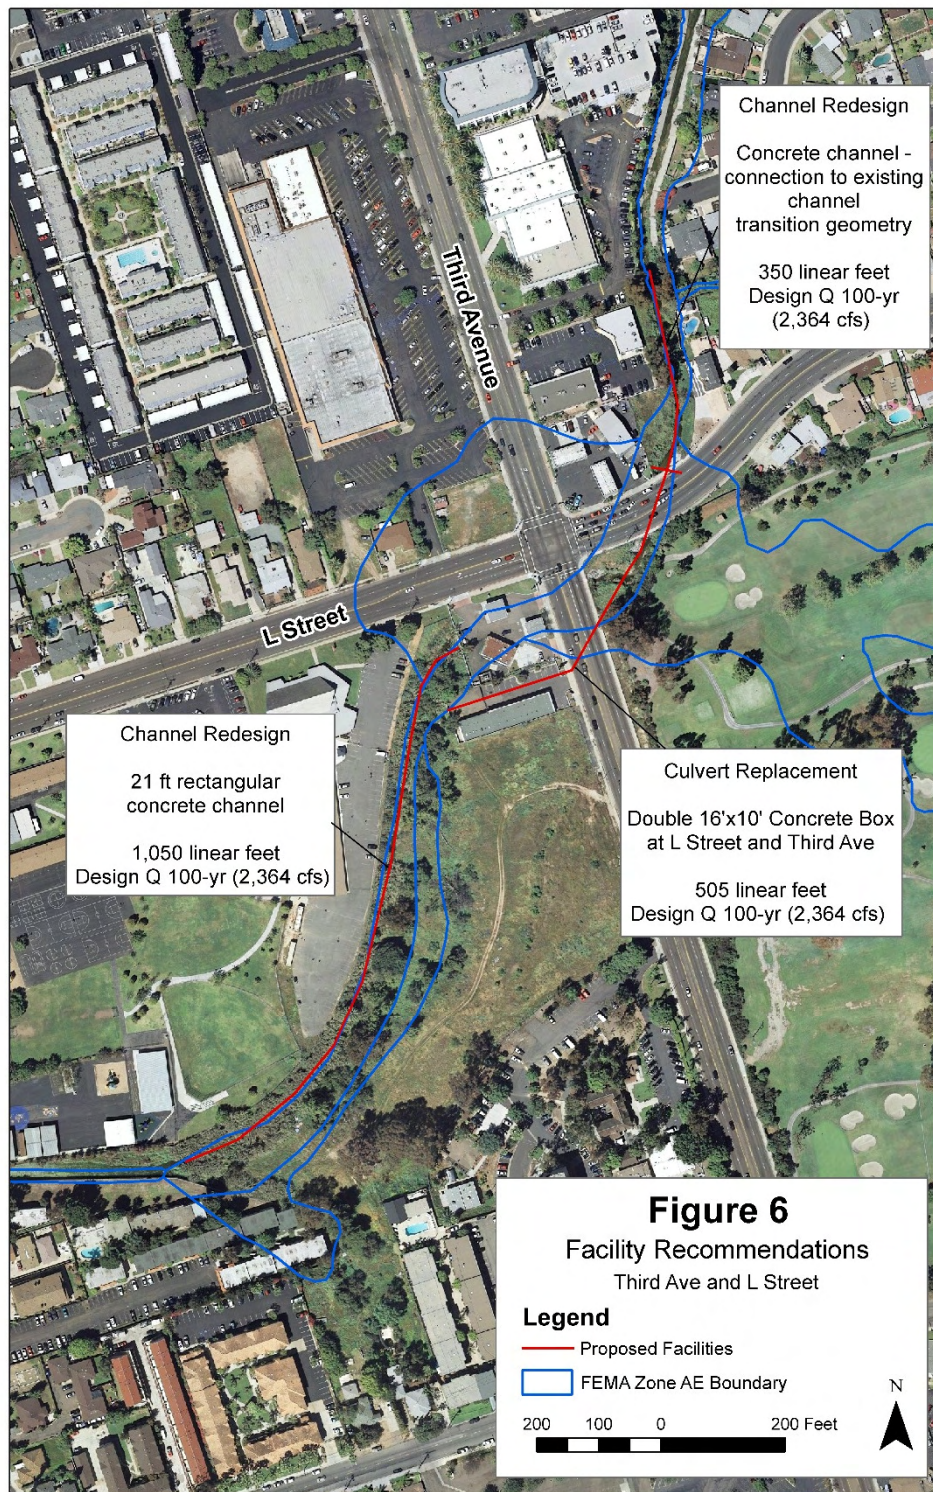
Facility Recommendation Locations – Third Avenue and L Street
